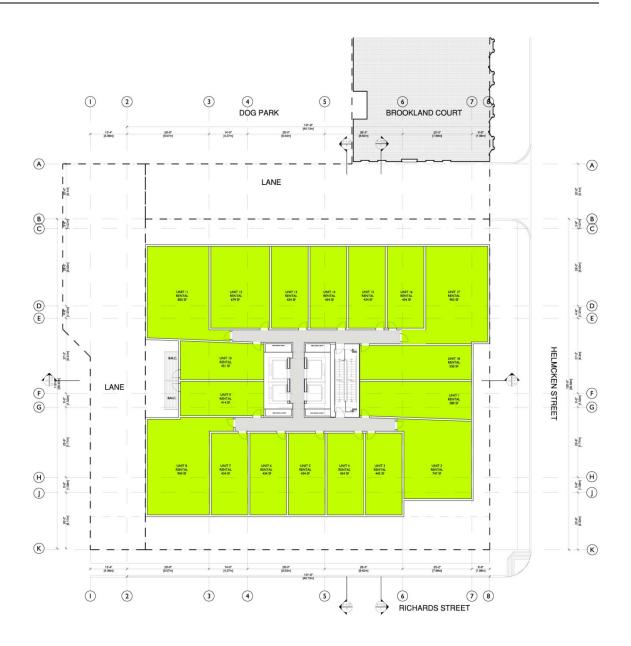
Typical Rental Floor Plan - Lower Levels 4-6
